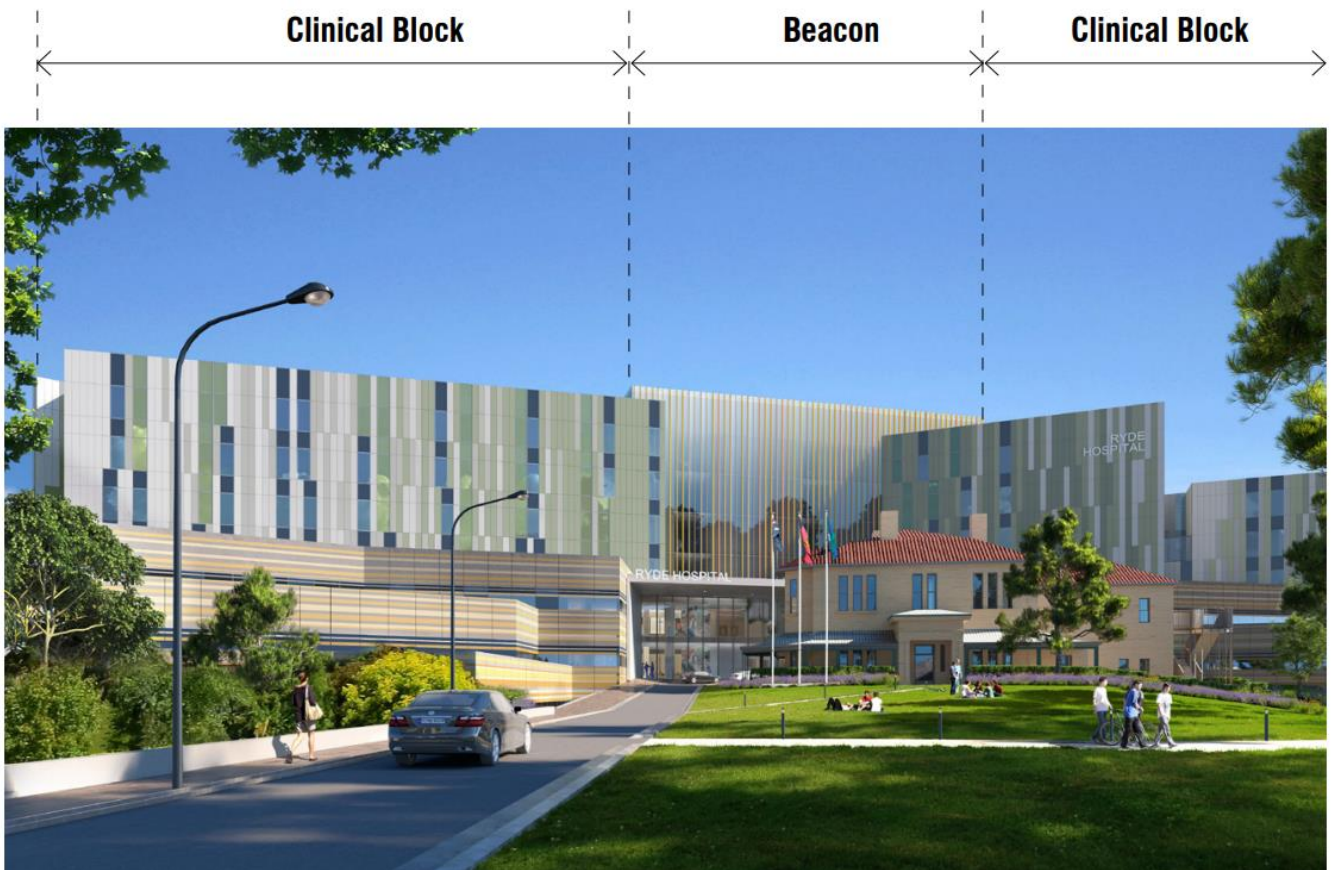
Artistic 3D Rendering of Proposed Building (from Denistone Road)
